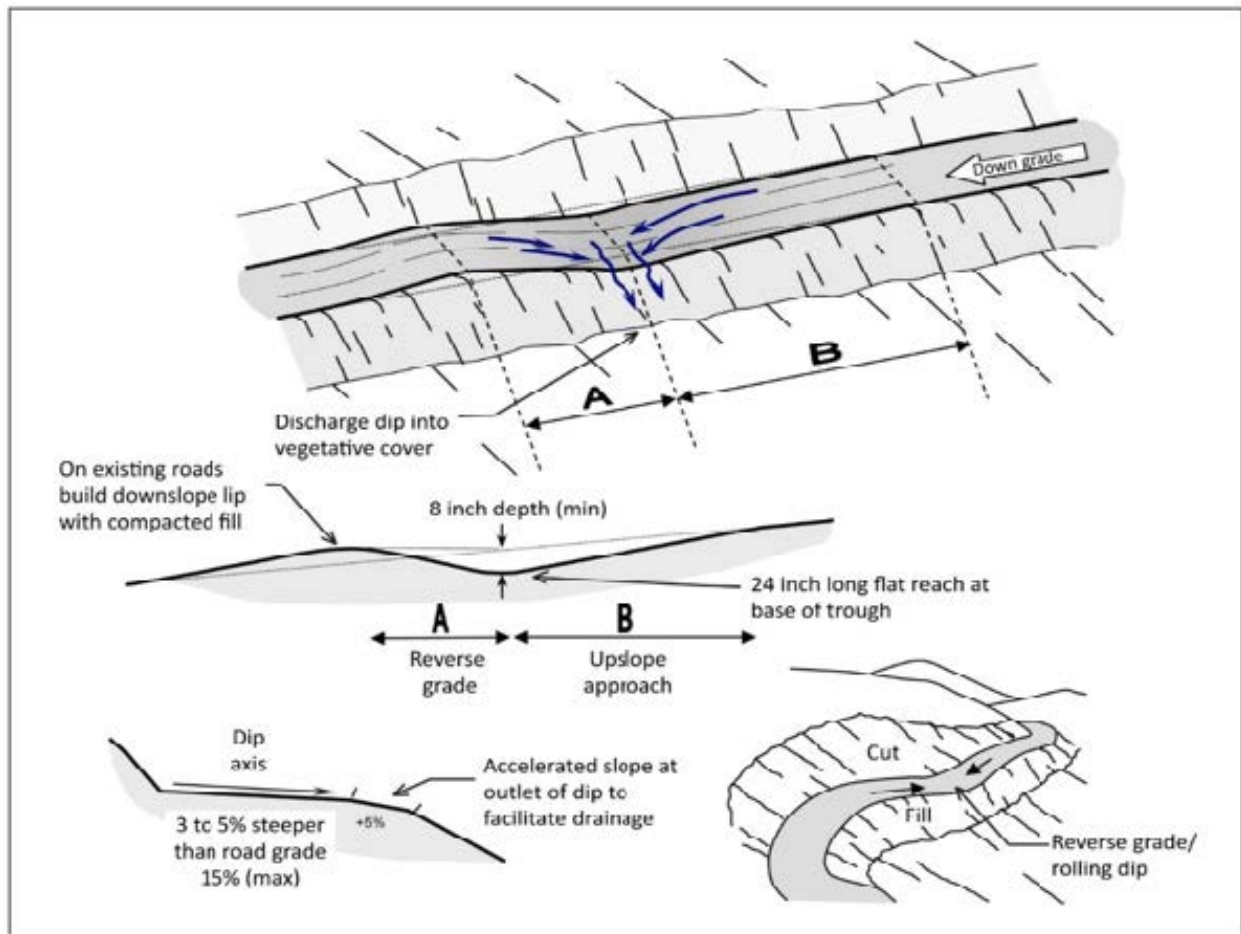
A classic Type I rolling dip, where the excavated up-road approach (B) to the rolling dip is several percent steeper than the approaching road and extends for 60 to 80 feet to the dip axis. The lower side of the structure reverses grade (A) over approximately 15 feet or more, and then falls down to rejoin the original road grade. The dip must be deep enough that it is not obliterated by normal grading, but not so deep that it is difficult to negotiate or a hazard to normal traffic. The outward cross-slope of the dip axis should be 3% to 5% greater than the up-road grade (B) so it will drain properly. The dip axis should be outsloped sufficiently to be self-cleaning, without triggering excessive downcutting or sediment deposition in the dip axis (Modified from: Weaver et.al 2015).
